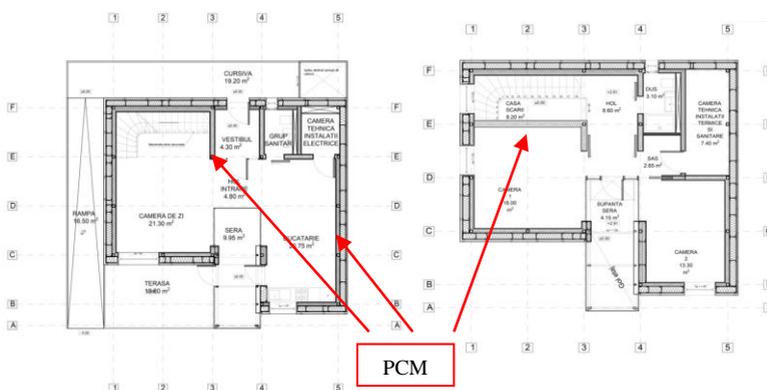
Ground floor and first floor – EFdeN Project. The placement of PCMs
